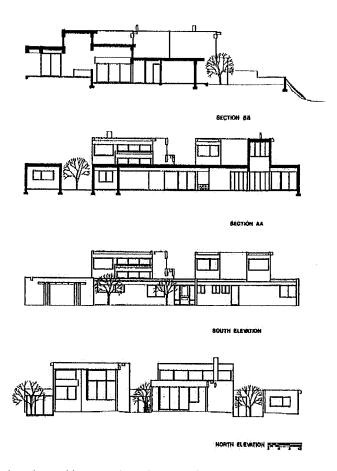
Jacobson House, elevations, Published in Powerhouse, 2019.
